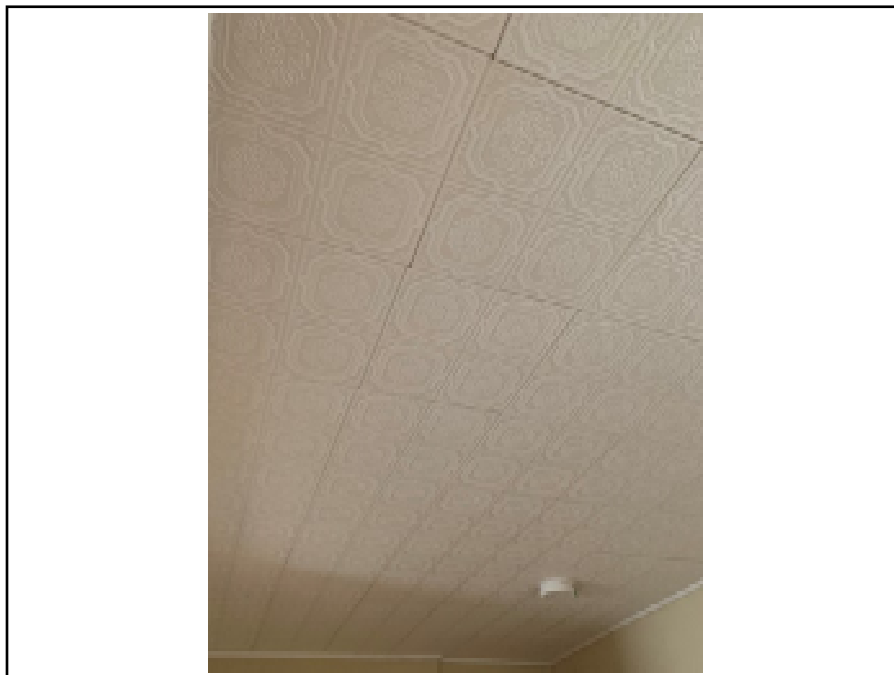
View of suspected asbestos containing wall and ceiling plaster throughout the subject building.
